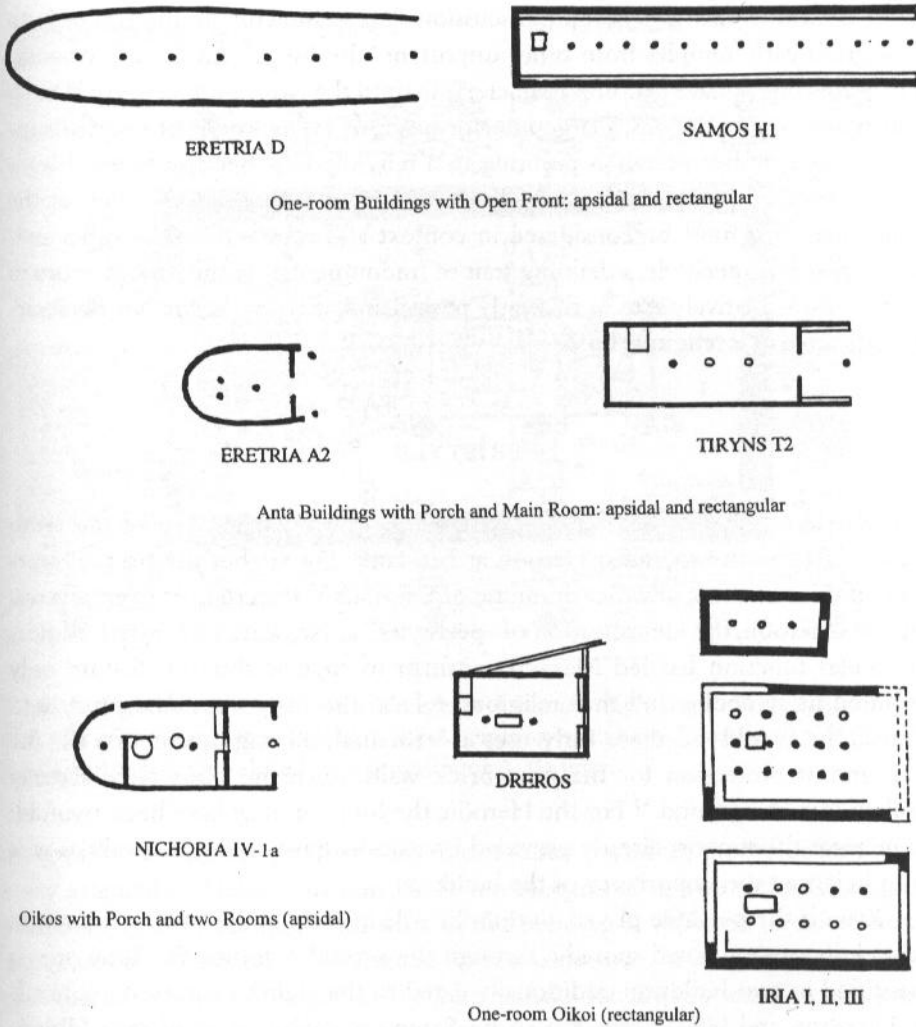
Sample plans of early buildings. One-room buildings with open front: Eretria D and Samos H 1; Anta buildings with porch and main room: Eretria A2 and Tiryns T2; Oikos with porch and two rooms: Nichoria IV-1a; One-room oikoi: Dreros and Yria 1, 2, 3, from A. Mazarakis Ainian, *From Rulers' Dwellings to Temples: Architecture, Religion and Society in Early Iron Age Greece (c. 1100–700 B.C.)* (Jonsered: Paul Åströms förlag, Studies in Mediterranean Archaeology, vol. 121, 1997) tables I, 1 and 10; II, 1 and 12; VI, 1; IV, 12 and 26, respectively, reproduced by permission of A. Mazarakis Ainian.
